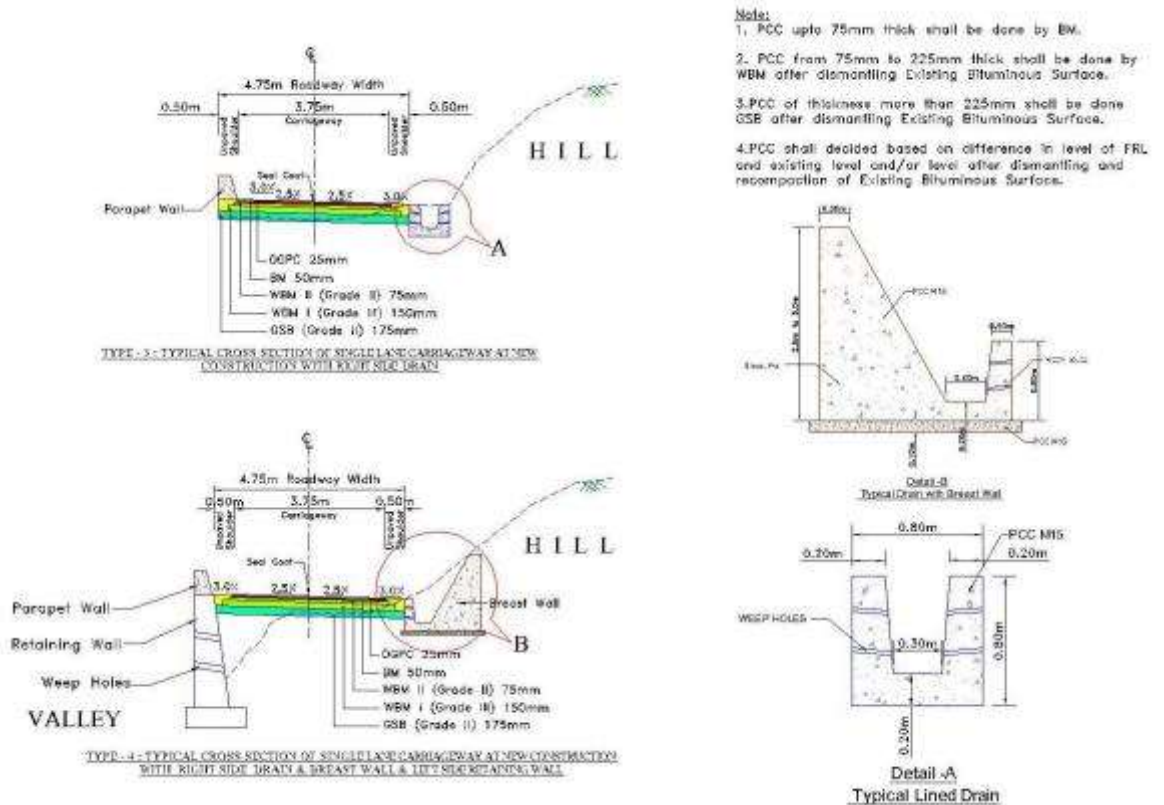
Typical Cross-Section of Single Lane Carriageway at New Construction with Right Side Drain and Breast wall and Left Side Retaining Wall.
